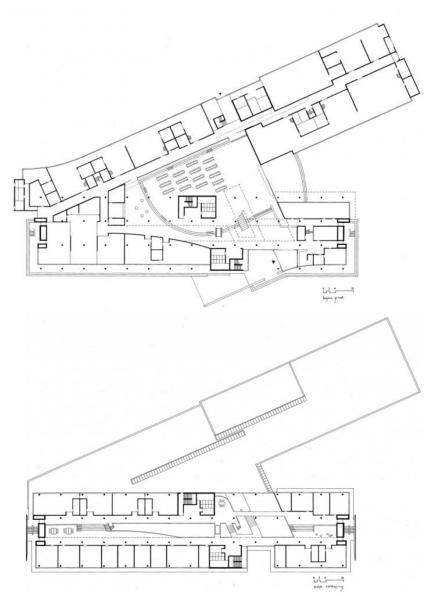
Montessori College Oost. Ground floor (top). 1st floor (bottom).
